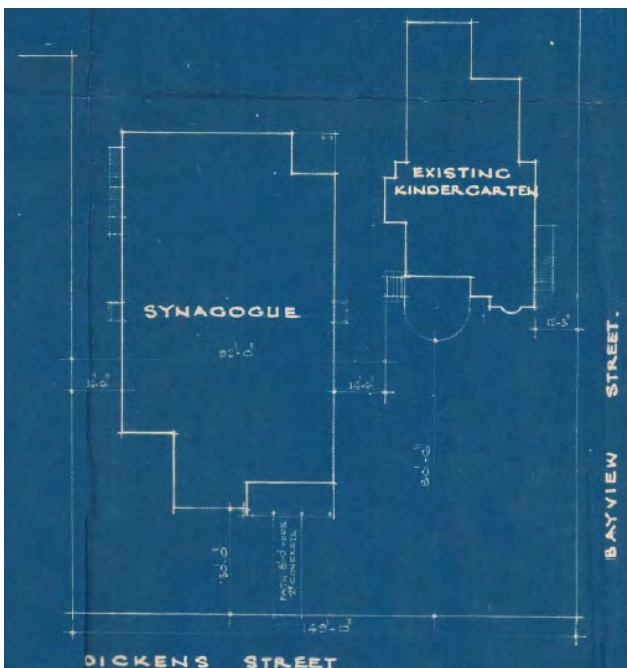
Building permit 2980 drawings (K Popper, undated). Site plan showing footprints of the kindergarten (former Allen residence) and the proposed new synagogue. Dickens Street is at the bottom. (Source: Council Building File)
